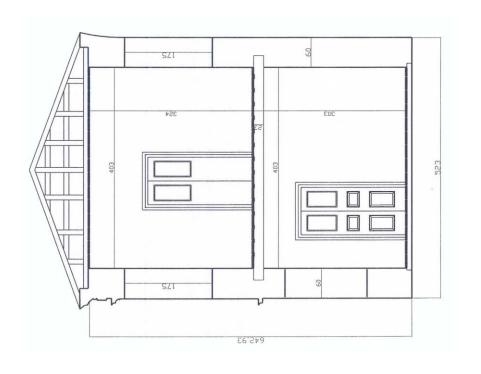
Section B-B view of 19-Hamam Street Scale: 1/75
